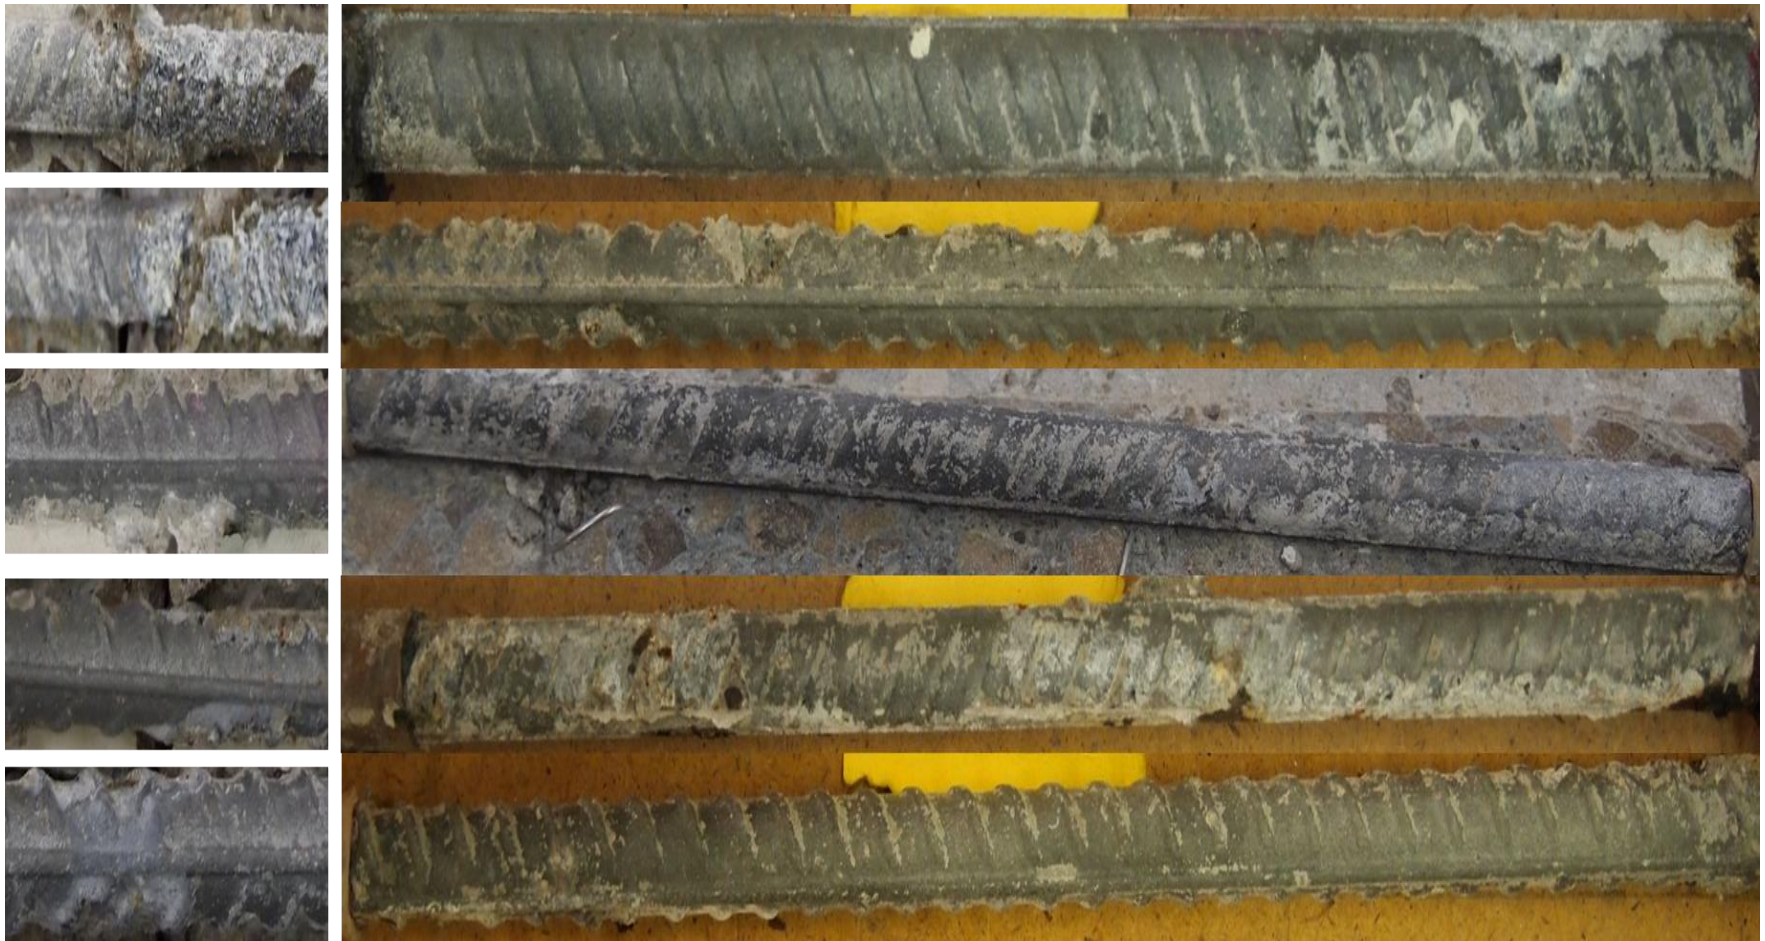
Non-exposed surface (to concrete crack) of transversely- (left) and longitudinally- (right) cracked C1 steel specimen 1 to 5.
